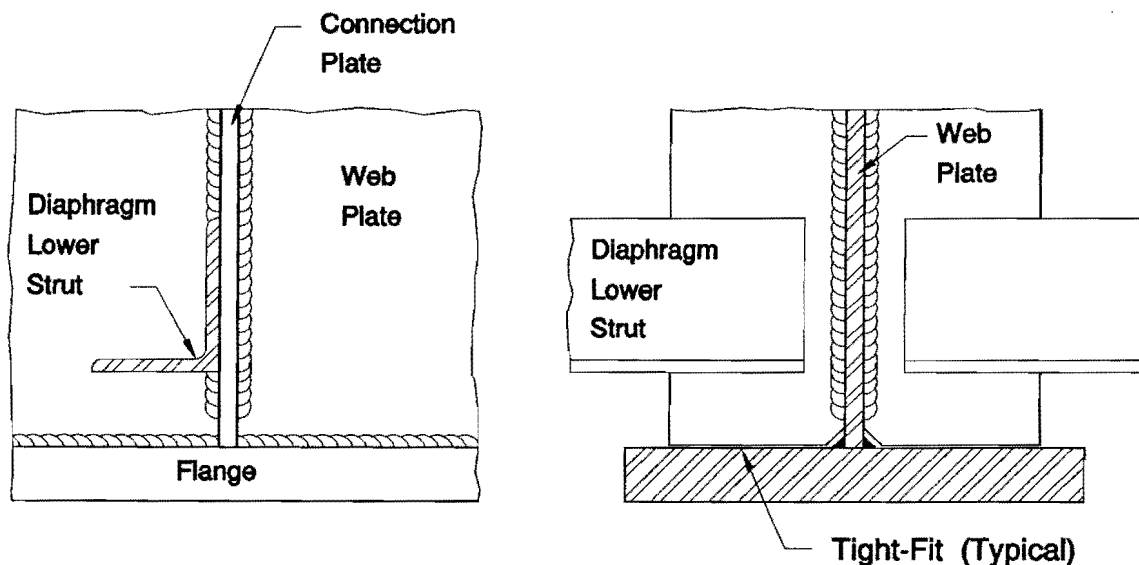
Connection plate detail (tight-fit) for original construction.
